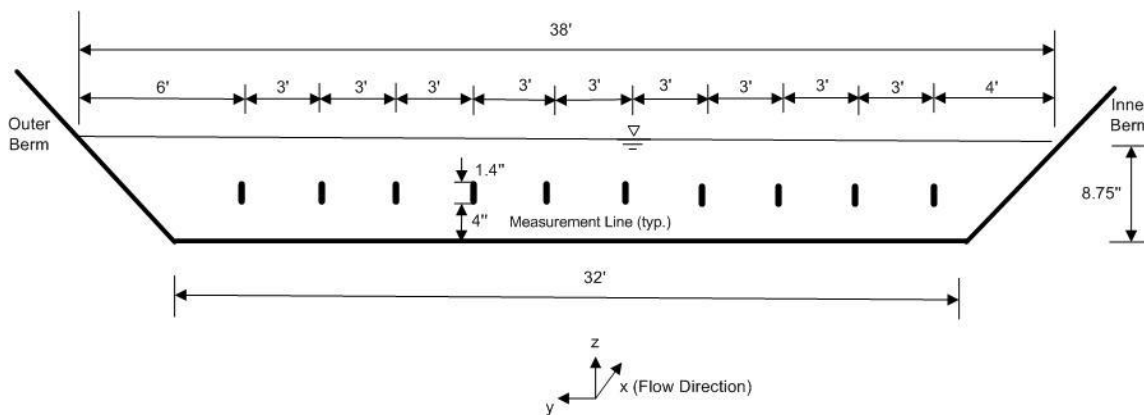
Layout of the pond's cross-section and the position of the measurement stations.
